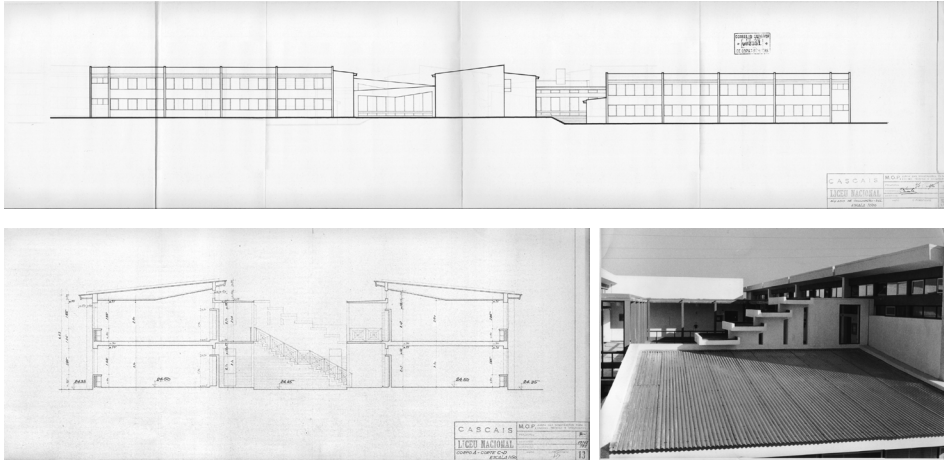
2nd Standardised Study. Elevation, cross sections and detailed photograph of the Cascais Lyceum (1964).
